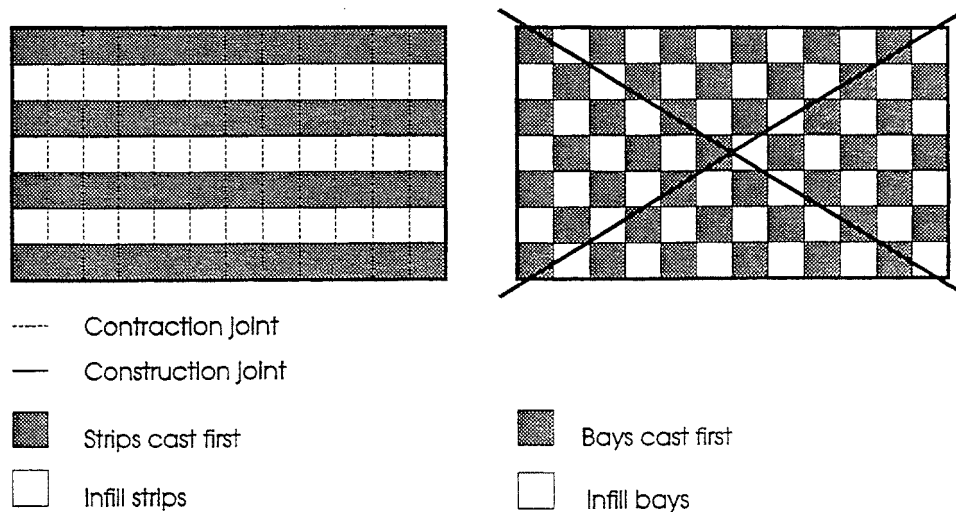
Placing sequence: long-strip construction (left) is recommended; checkerboard construction (right) is not recommended.
